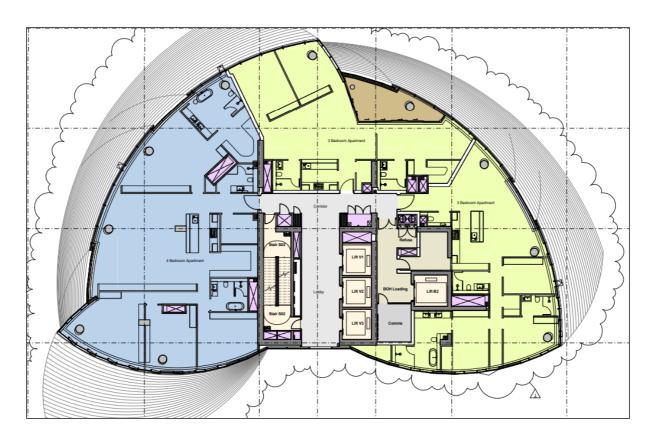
| Approved 2 x 3 bedroom and 4-bedroom apartment layout on Level 48 (Source: MOD 1)
